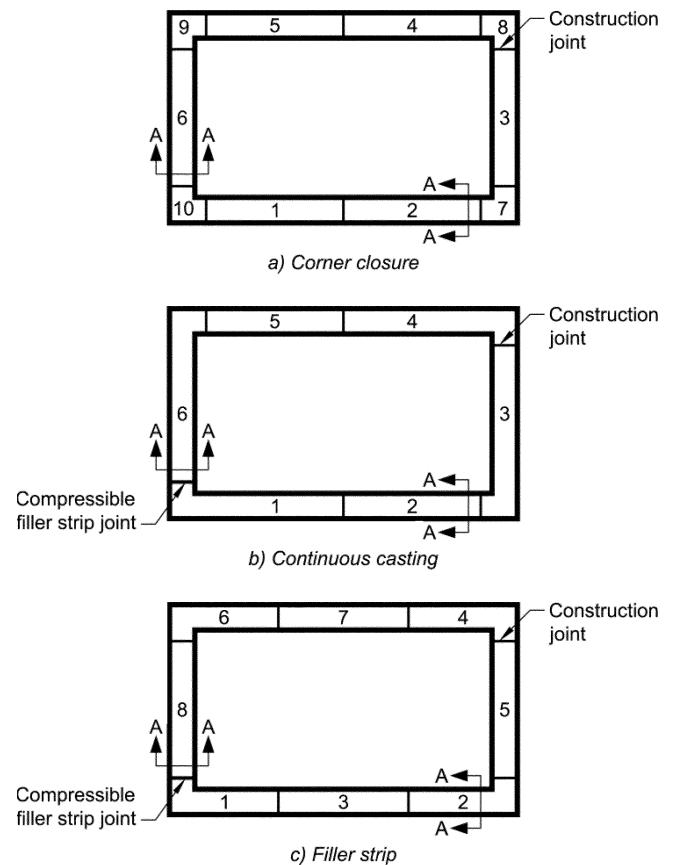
(c) shows a plan with filler strip wall construction. The plan shows a variable sequence of wall construction, starting with two ends of a wall and their corners. Next, the section between the two ends is cast with compressible filler at one end and a construction joint at the opposite end. The remaining sections are cast similarly by casting another end section and then casting the infill jointed as noted previously. There is always compressible filler at one end of the wall section to allow for expansion. In all wall sequences, the architect/engineer is to determine wall length between joints.
